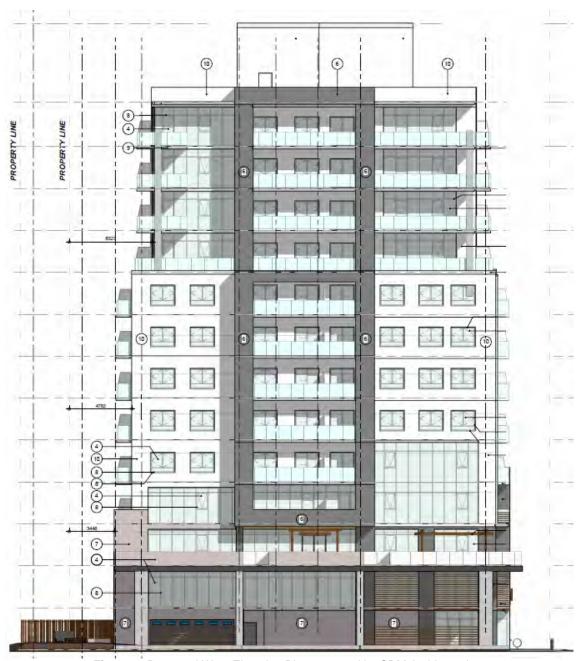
Proposed West Elevation Plan prepared by SRM Architects Inc.
